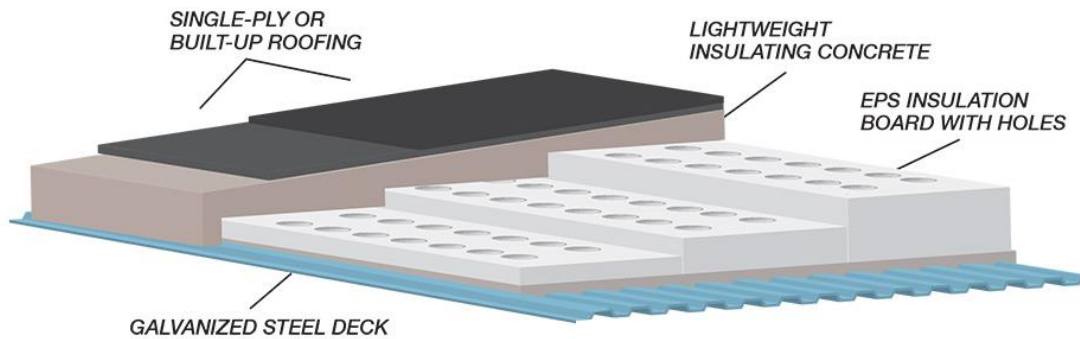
8: Section of roof insulation layers done by Texas Roof Management Inc.
